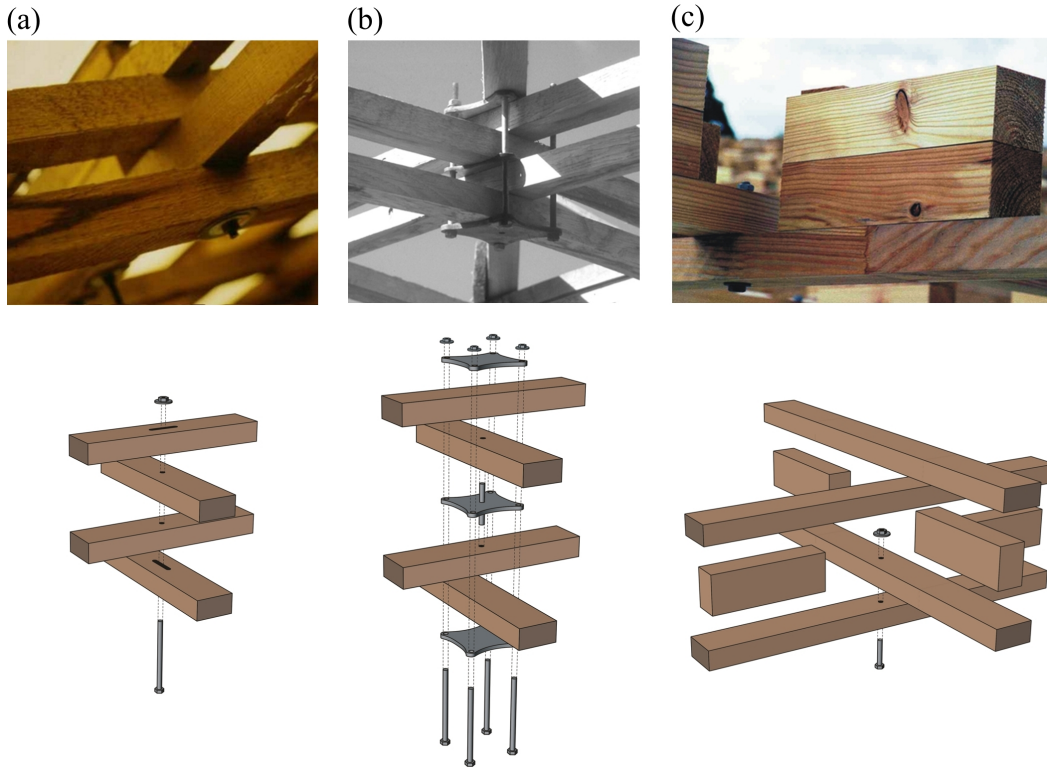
Double-layer technique according to the connection system: (a) Slotted-holes; (b) Clamping plate; (c) ‘Thick’ shear blocks.
